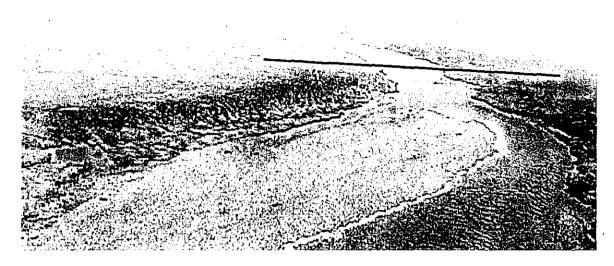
Looking northwest at the proposed pipeline crossing (6/11/98).
